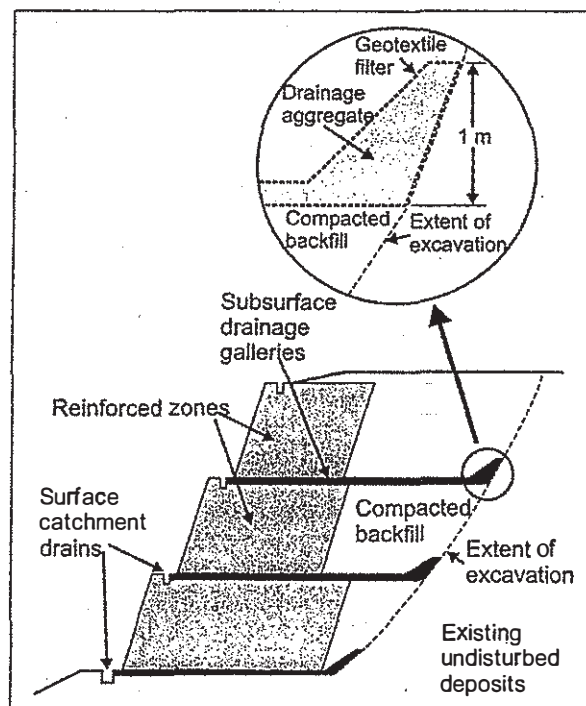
Recommended drainage layout in steep, high, reinforced slopes (After Lawson & Yee, 1998).
